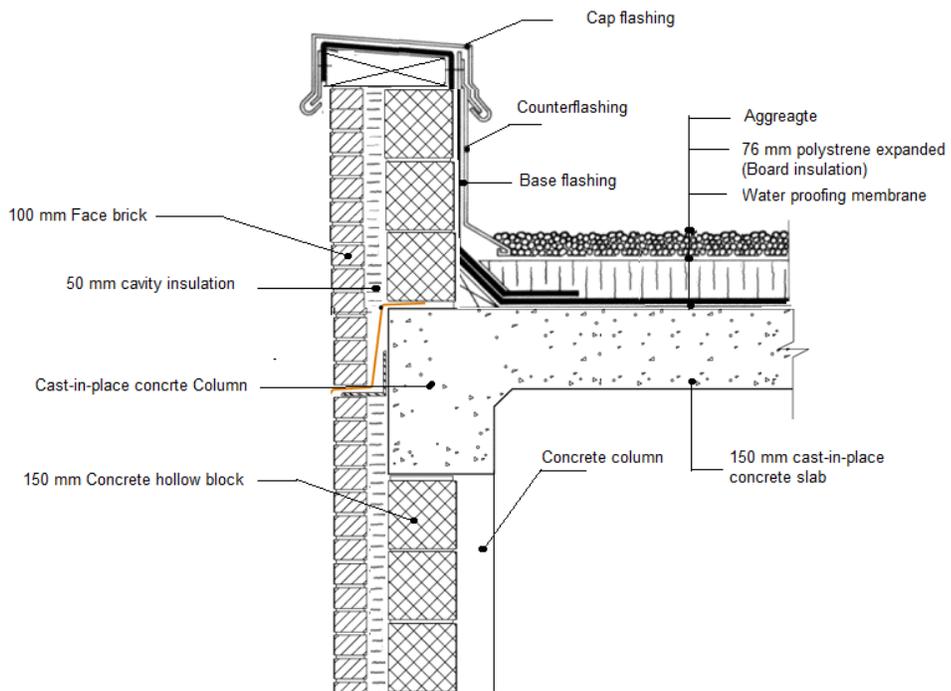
Detailed section for masonry concrete alternative (CM)
